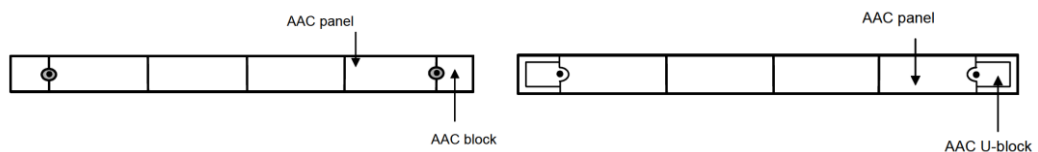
Plan View of Shear Wall Specimens 15a, 15b (left) and 16 (right) (Tanner, 2003)
